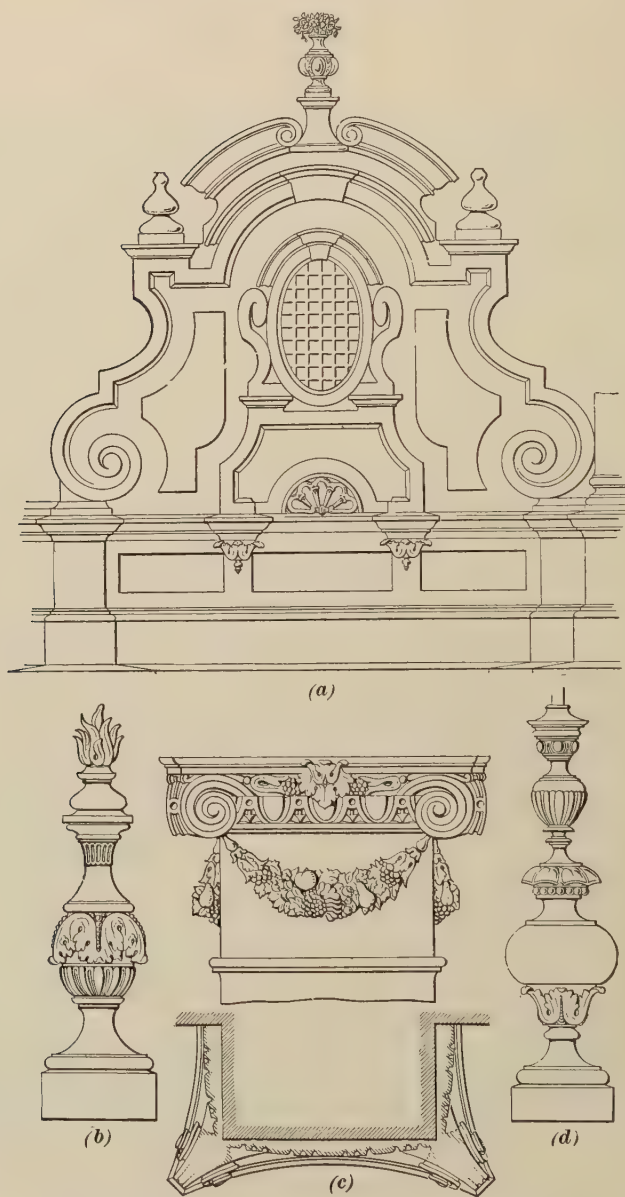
DETAILS FROM CHURCH OF THE BÉGUINAGE, BRUSSELS
